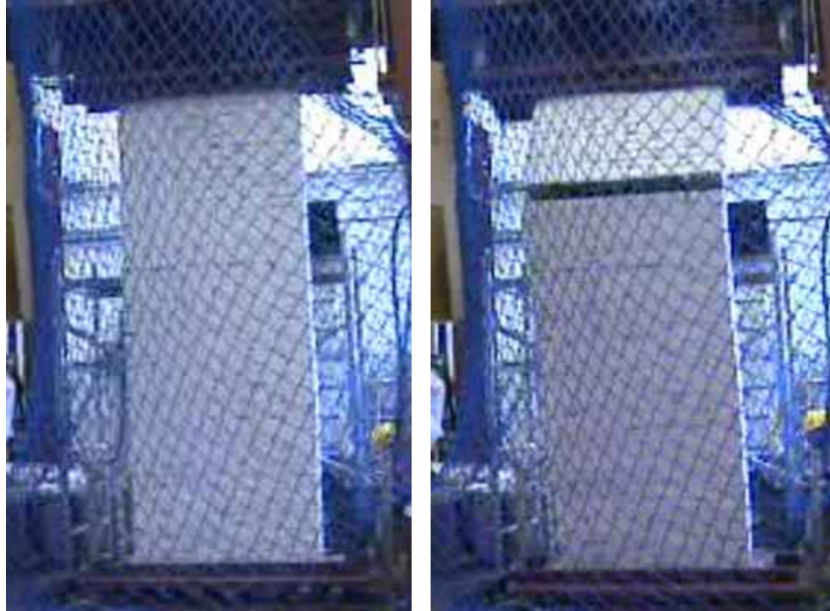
126 Wall W#5 at the beginning of the test (left) and failing (right)
